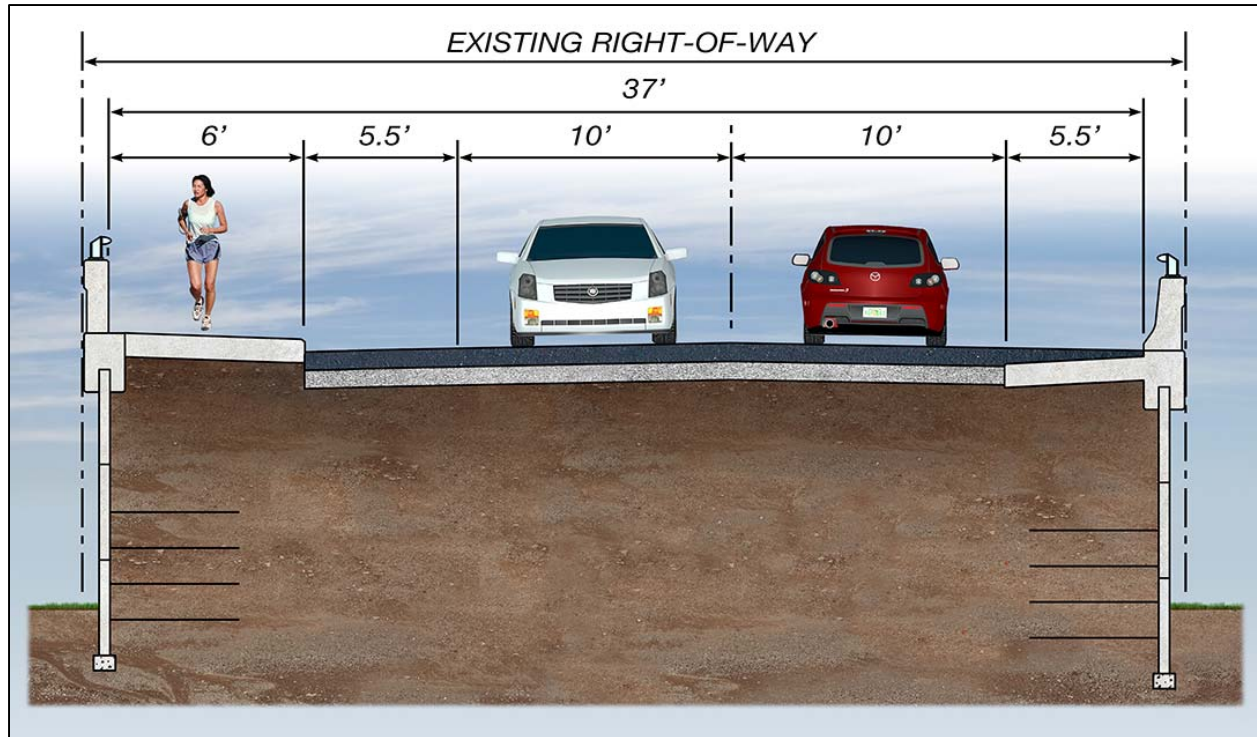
Proposed Roadway Section West of Proposed Fixed Bridge
